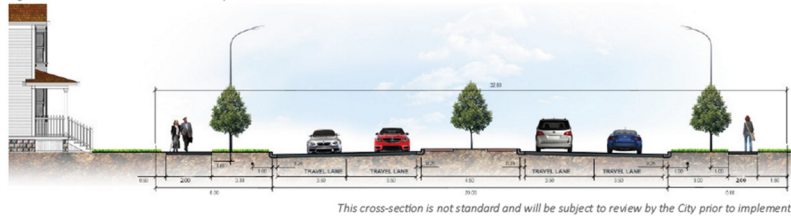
32.0m Divided Collector Roadway Cross-Section at Protected Parking
